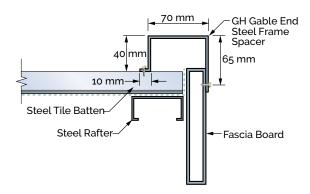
Gable batten installation Angle trim with steel frame gable end spacer
